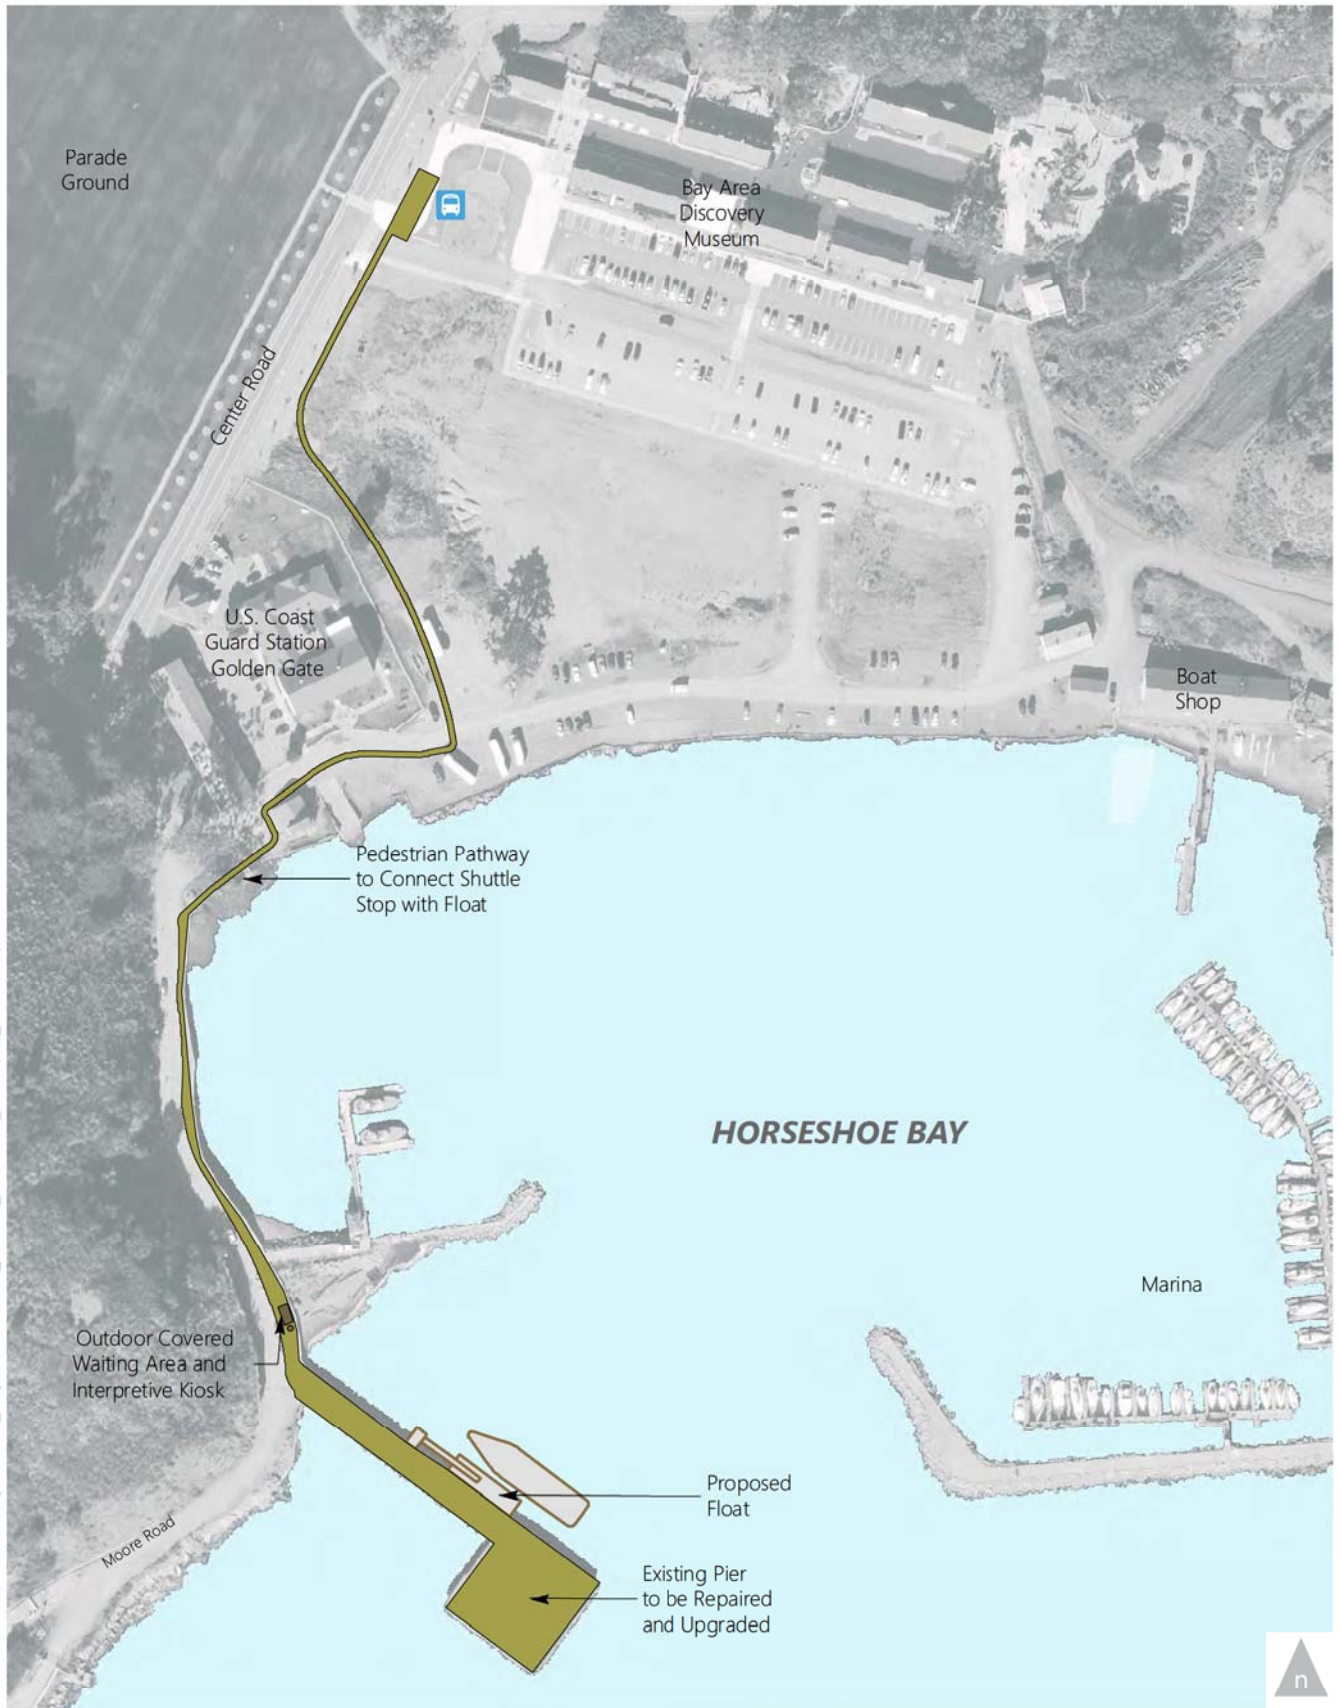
shows the concept plan for the proposed improvements at Fort Baker. The construction necessary to establish ferry service at Fort Baker would primarily involve upgrades to the existing concrete pier, which was constructed for military purposes in the late 1930s. The pier, an extension of Moore Road, is located at the mouth of Horseshoe Bay at the southern tip of the Fort Baker site. In addition to structural upgrades, water and lighting utilities would be extended and rerouted to the pier. Finally, a new pedestrian pathway would be constructed to connect Cavallo Point Lodge and the Bay Area Discovery Museum with the pier. The proposed path would require updating existing pedestrian infrastructure on the pier and the path between Cavallo Point Lodge and the Discovery Museum, as well as constructing an entirely new path, measuring approximately one-quarter mile, between the Discovery Museum and pier. These upgrades would include adding ADA-compliant ramps to the Murray Circle sidewalk where it intersects the access road between Murray Circle and McReynolds Road just north of East Road.
